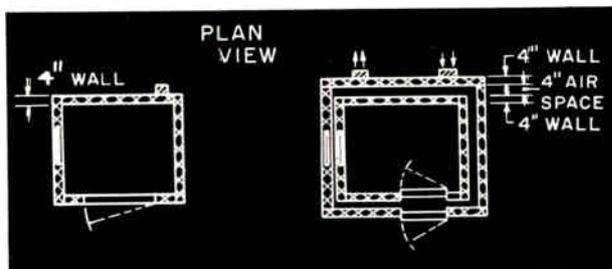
Plan view of a single and double-wall quiet room. Tables 1 and 2 pertain to these types of rooms.
